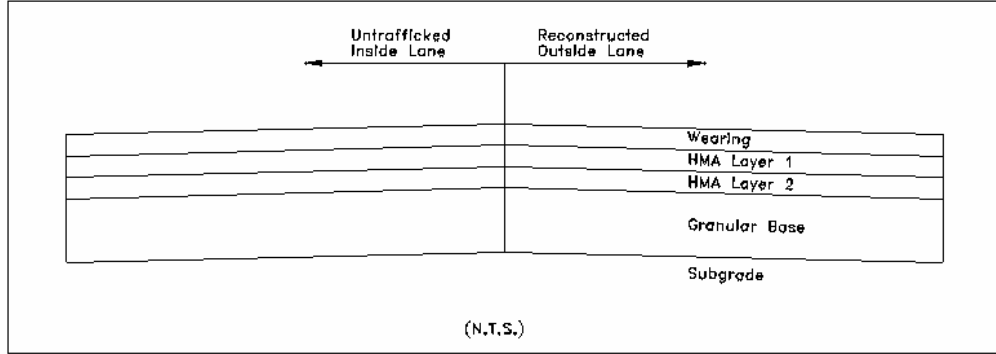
Typical Section of Reconstructed Lane on North Tangent.
